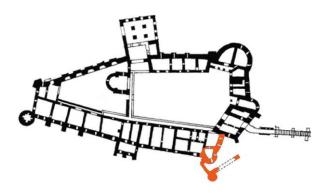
Janowiec Castle - the north defence wall Wall coping: foreign calcite stone and ceramic brick used for rebuilding the inner and outer parts respectively
